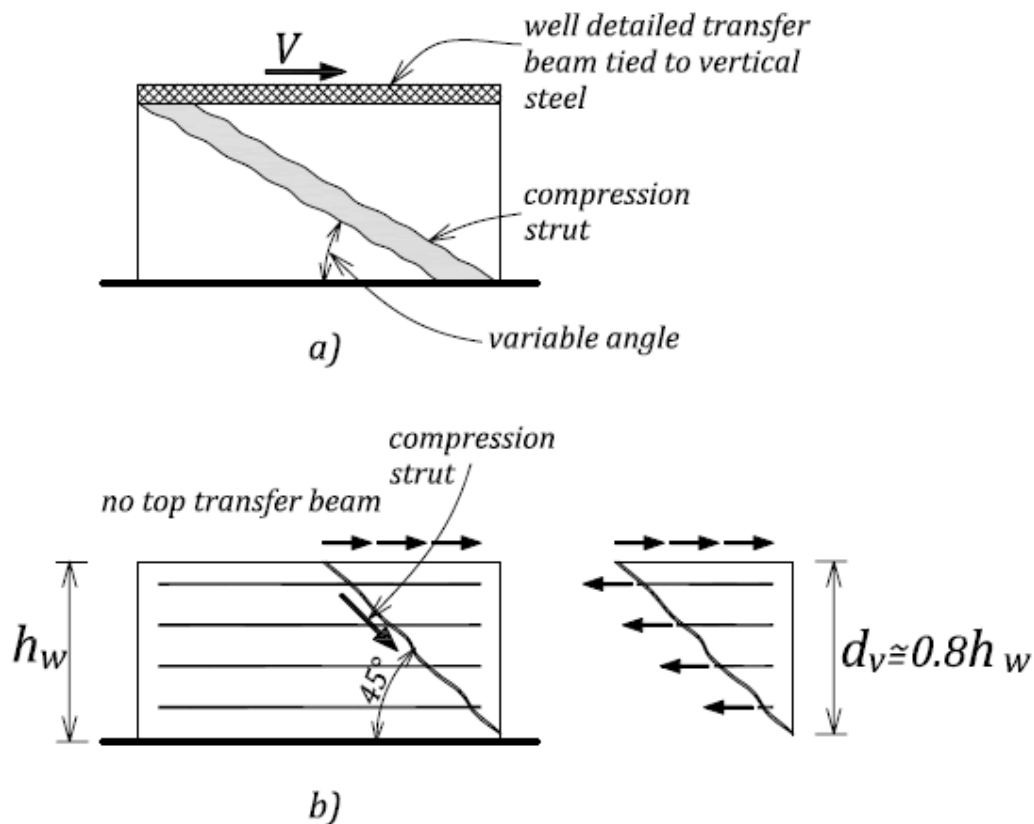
Shear failure mechanisms in squat shear walls: a) wall with the top transfer beam – a desirable failure mechanism; b) partial failure of a squat wall without the top beam.
